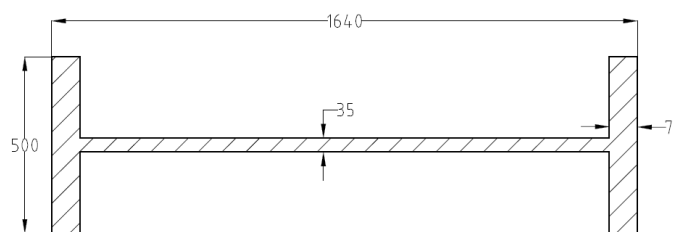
Custom cross-section for the arched beam (dimensions given in mm)
